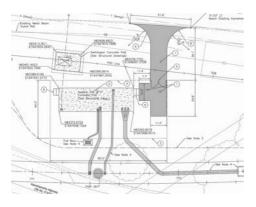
Typical Site Plan for TPSS Courtesy of HART
